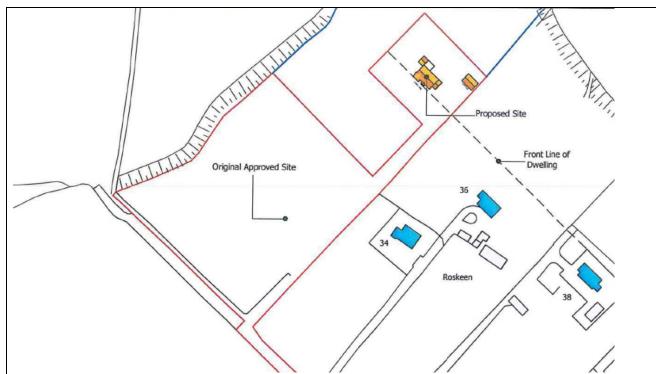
Current site location plan showing approx. location of previously approved dwelling and garage; and location of the change of house type including garage proposed.
